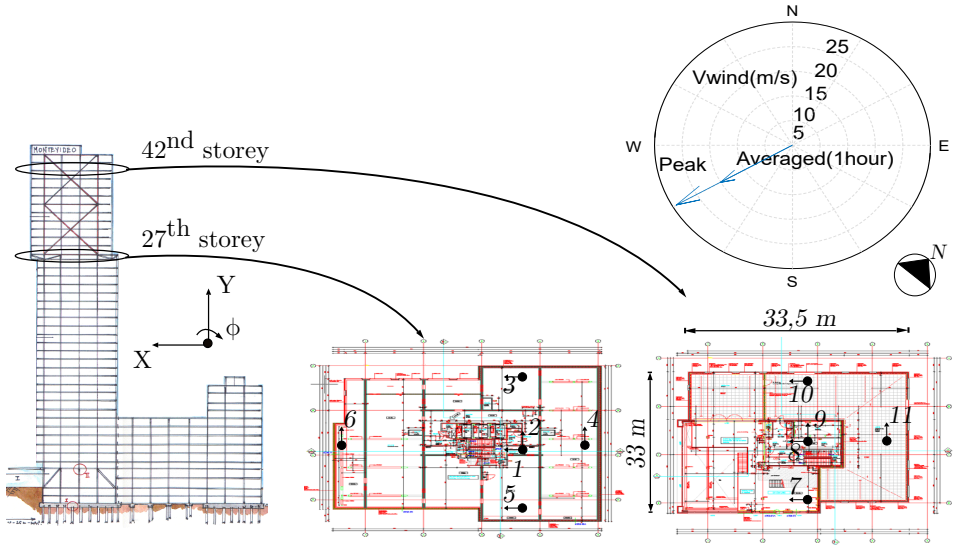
MonteVideo Tower layout, instrumentation set-up and measurement wind conditions.
